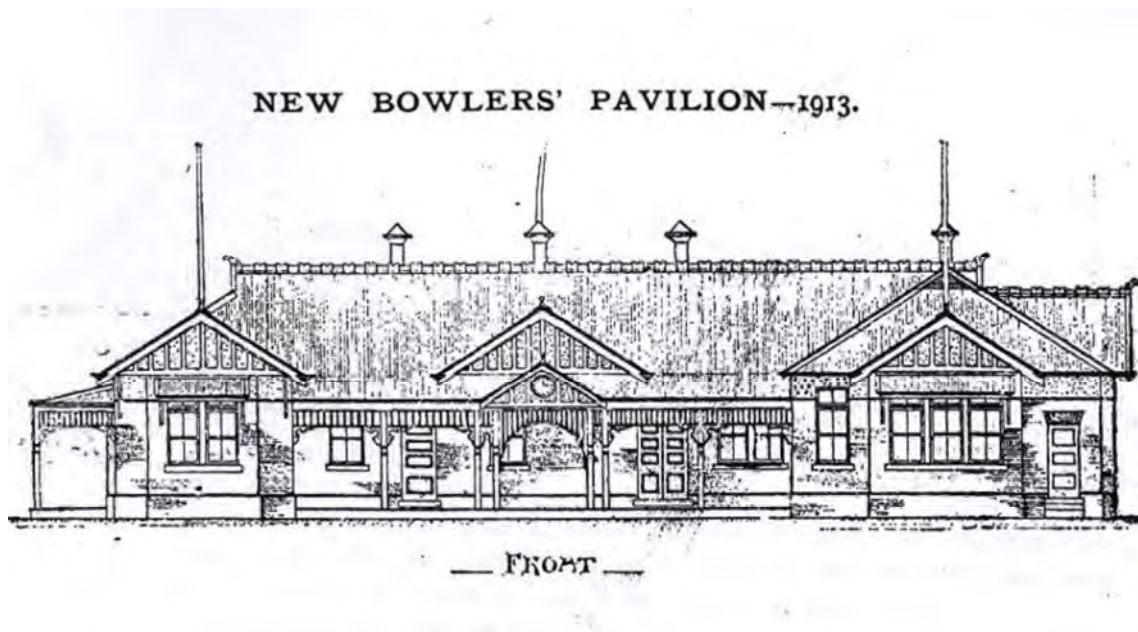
Elevation of the new bowlers' pavilion, c. 1913
